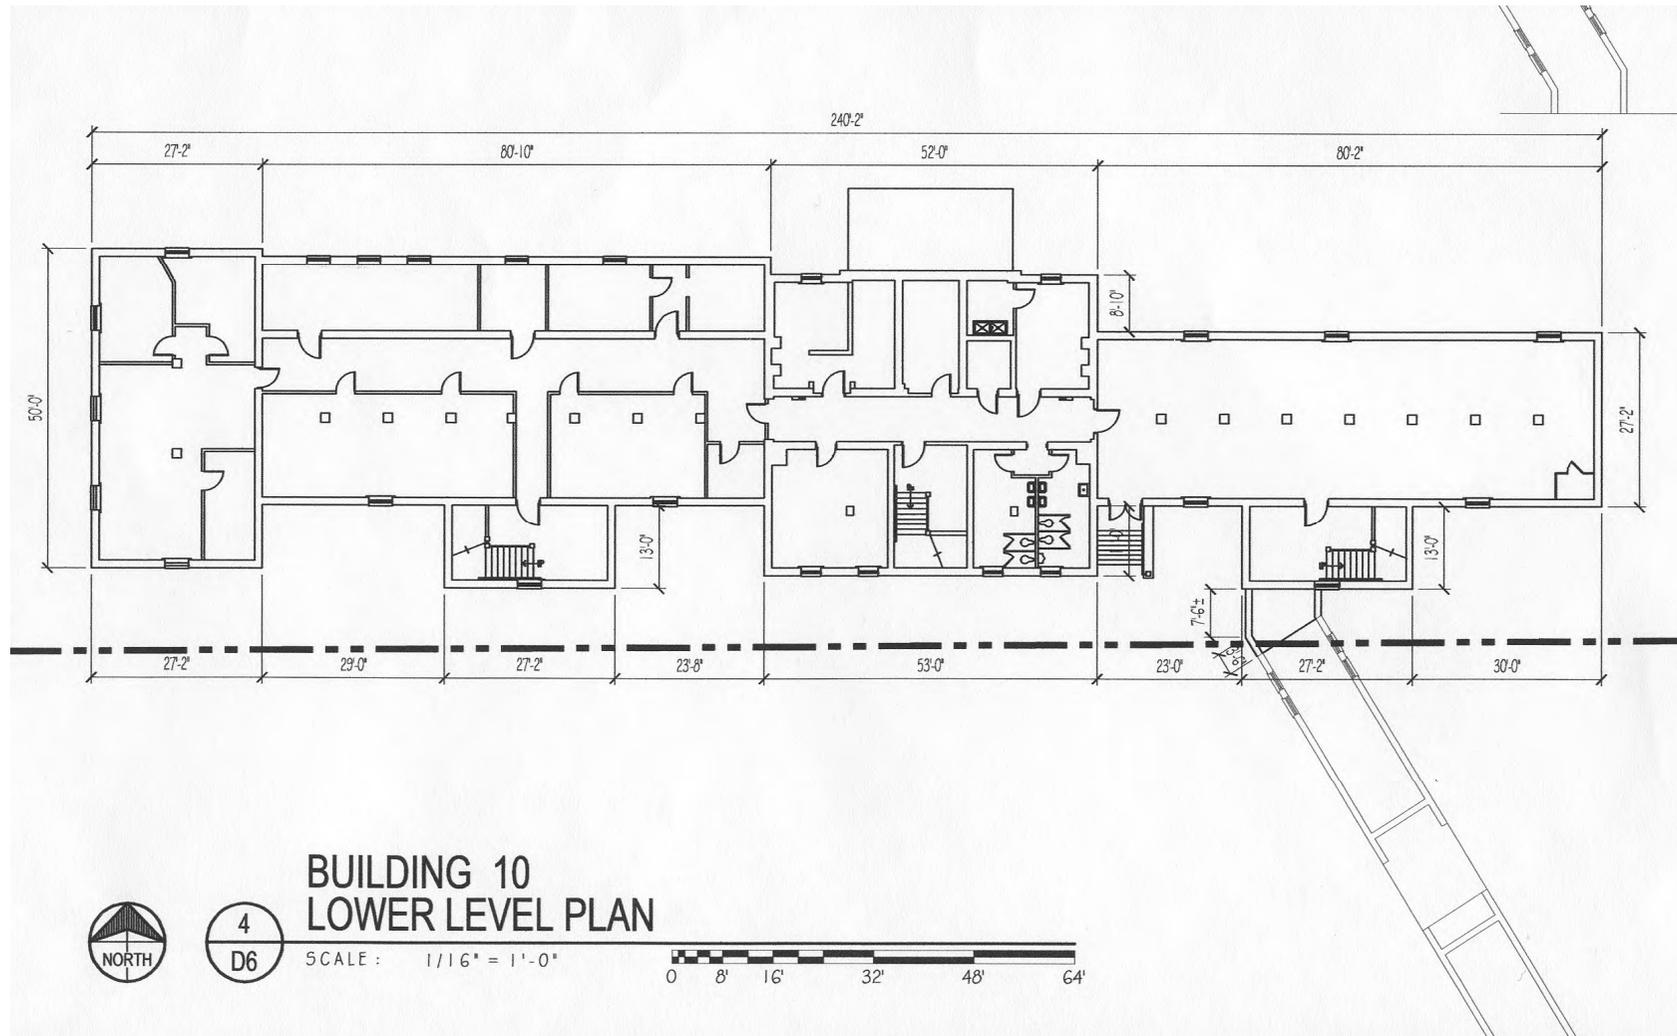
Basement plan of Building 10, showing existing conditions (Walton and Associates 2003).
